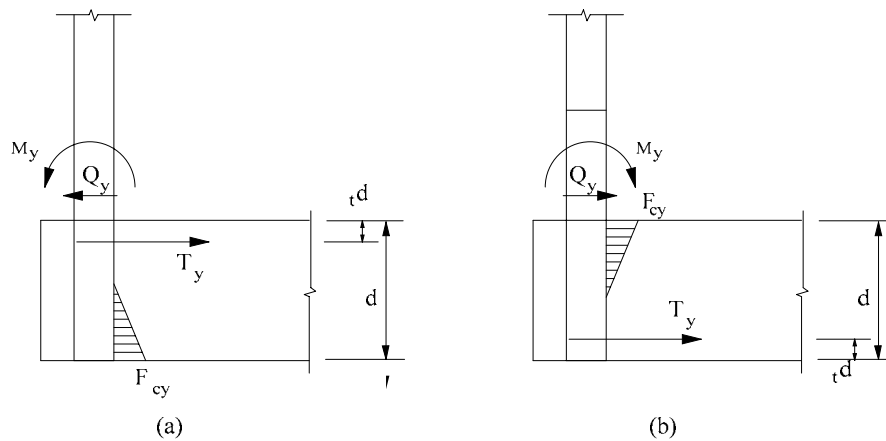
Elastic bearing stress distribution on the foundation and tension forces on the steel Reinforcement [after AIJ (2001)]
